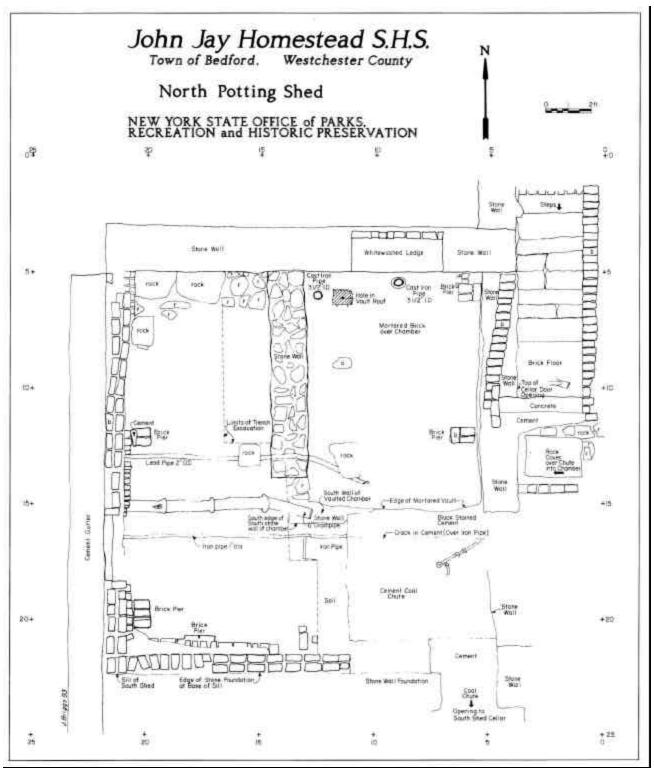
Overall plan view of excavated features exposed under the floor of the potting shed. From left to right, walls and piers for supporting the shed; test trench next to the stone wall that was the rear wall oft he buried chamber; roof of the chamber; east wall that supported the potting shed; stairway and coal chute into the underground chamber. A more recent cement coal chute also exists toward the bottom which fed coal into a small stove used in recent years to heat the south potting shed.
